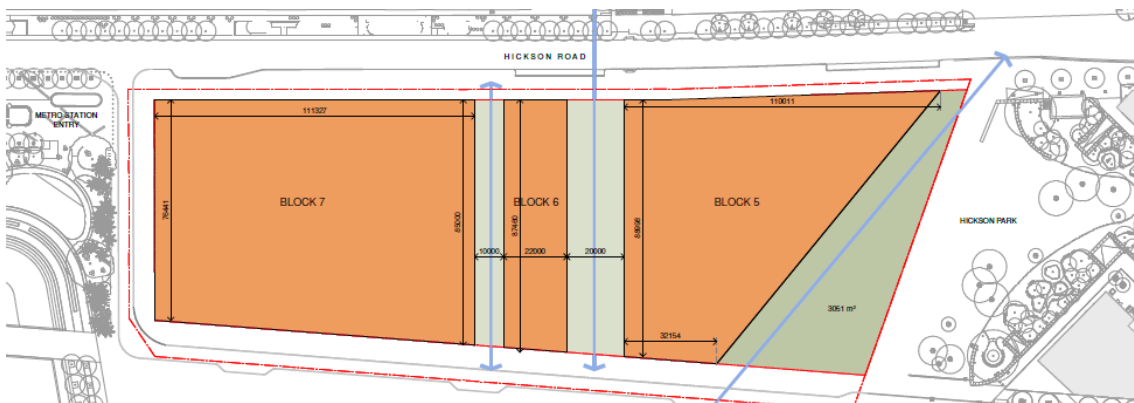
Plan of the approved concept plan envelope according to the 2024 Urban Design Report. (Source: Central Barangaroo Urban Design Report and Design Guidelines, prepared by SJB, 28 November 2023).
